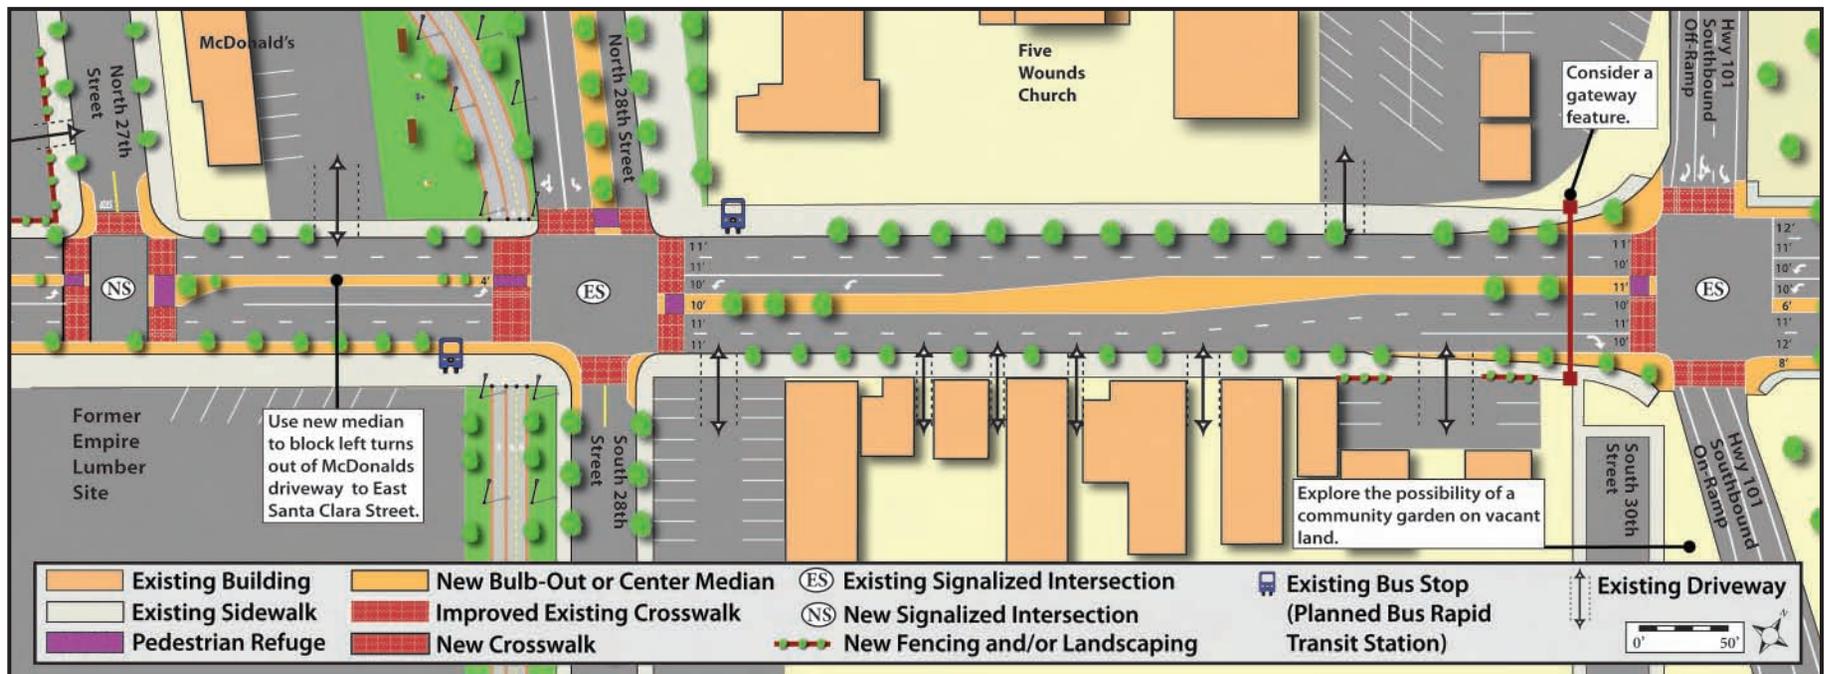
East Santa Clara Street/Alum Rock Avenue - Segment #5.
